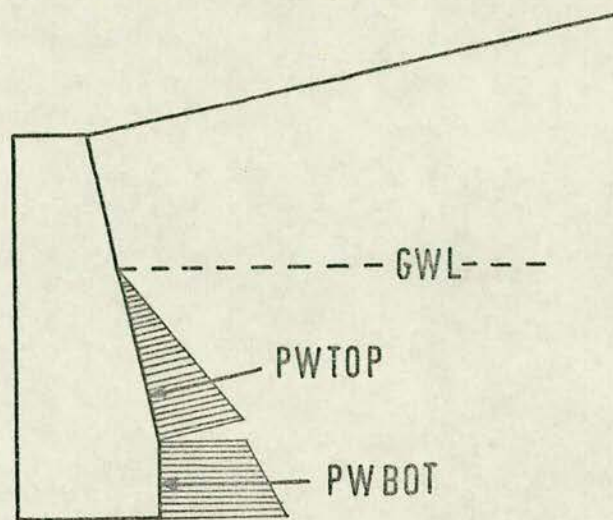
WATER PRESSURE ON GRAVITY WALL
